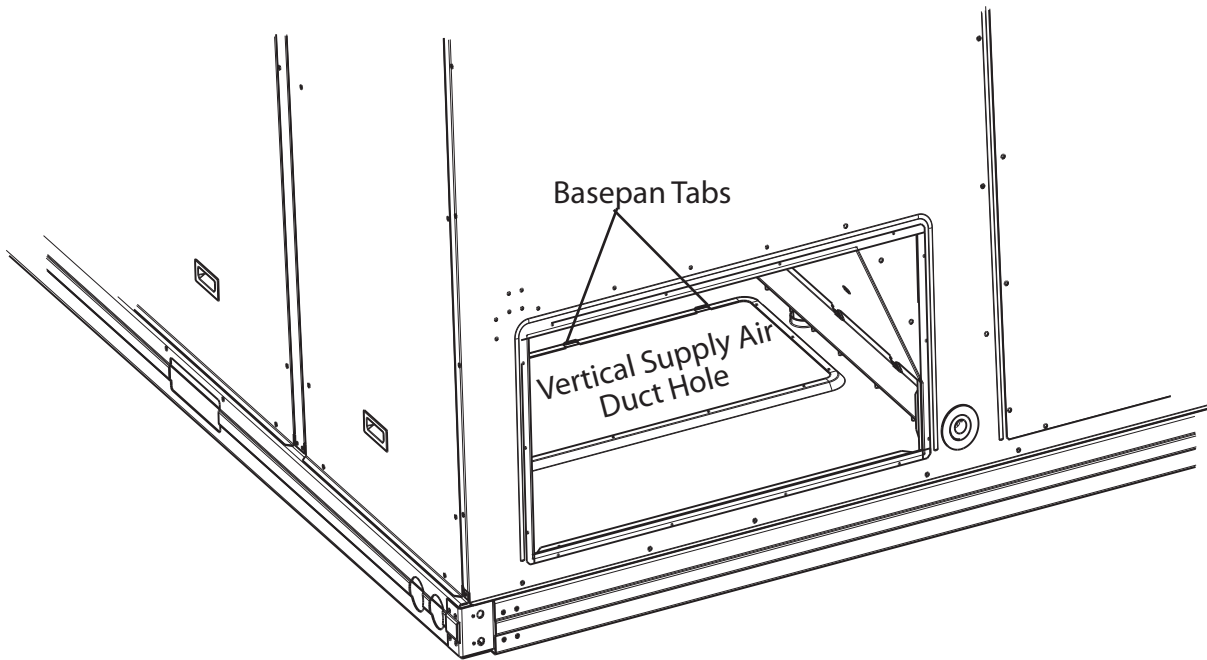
View Through Horizontal Supply Air Duct Hole with Cover Removed
